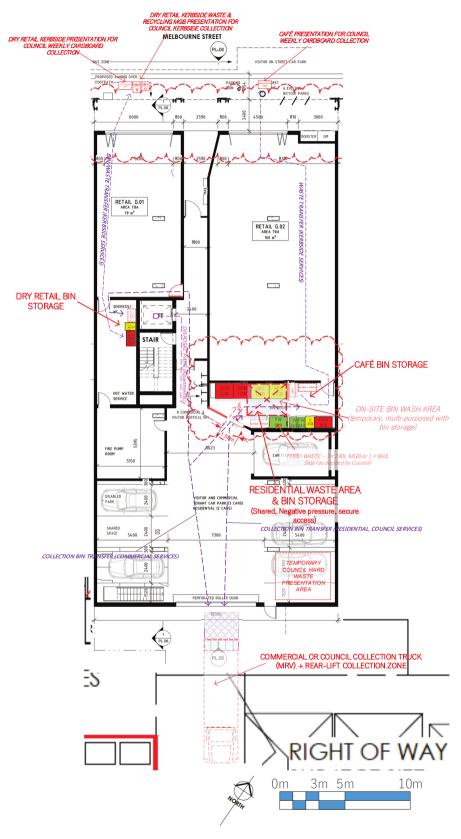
Ground Level plan and site boundary for Development, reproduced from the Drawings. This figure illustrates proposed waste system features which will be discussed later in this WMP.
